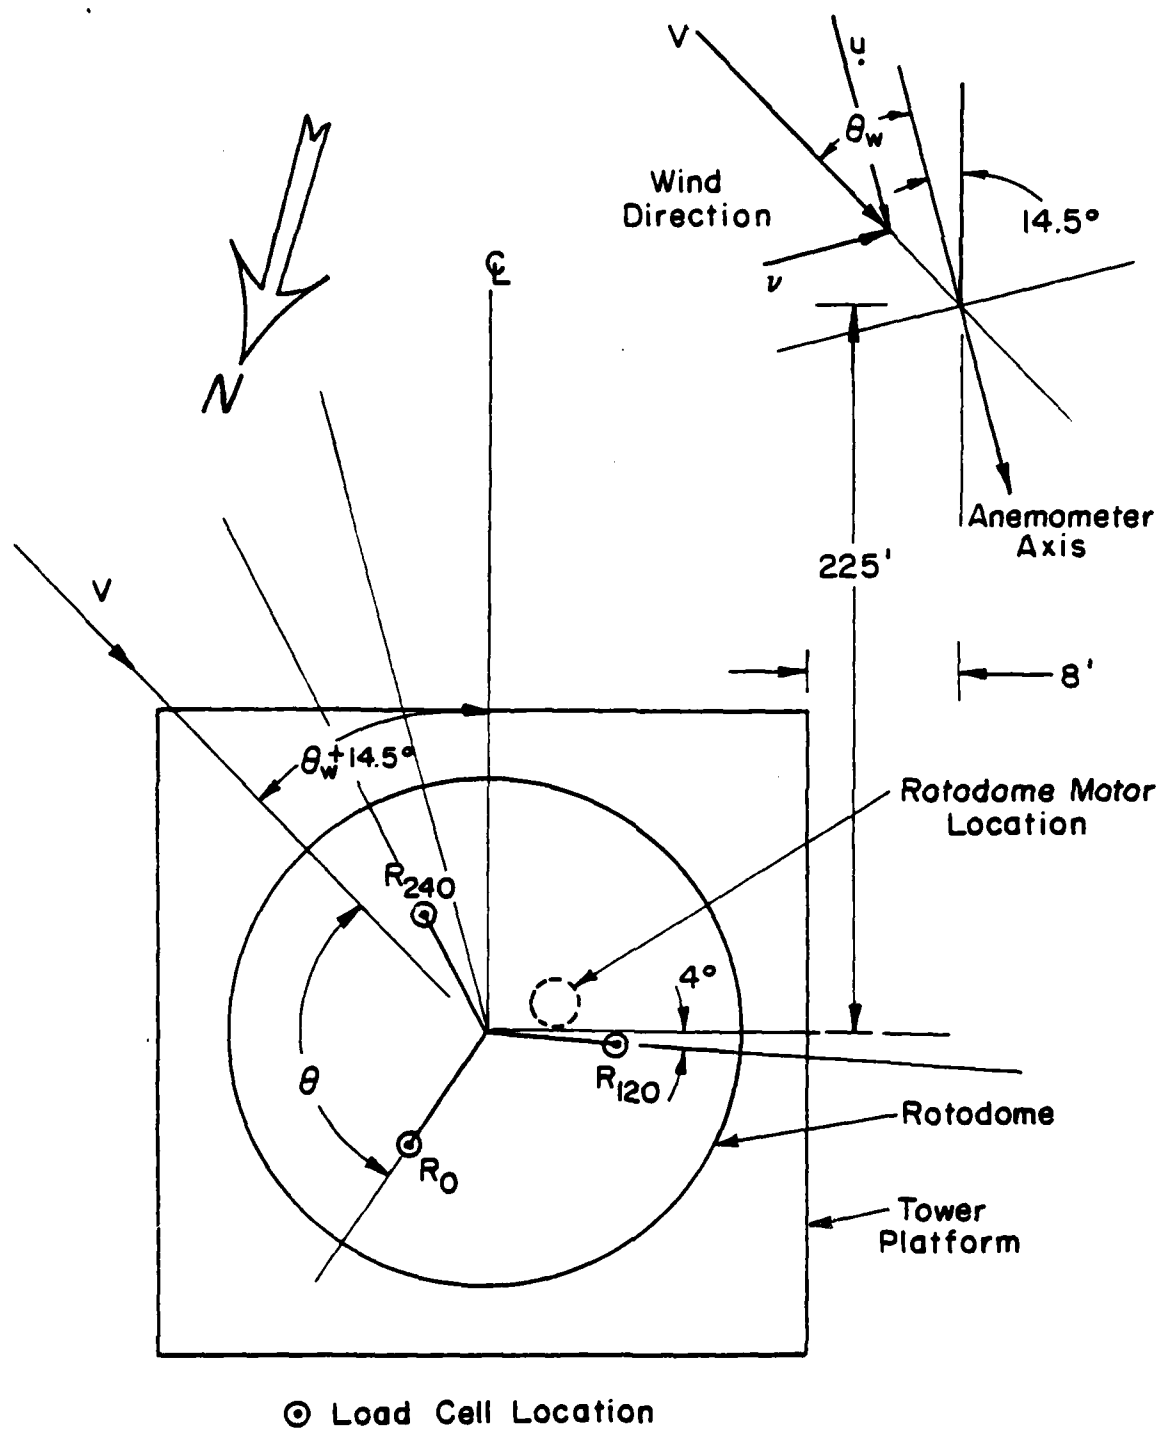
FIELD TEST INSTRUMENTATION LAYOUT
